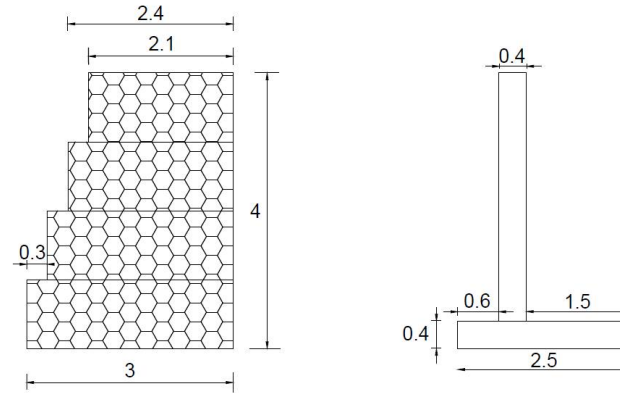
Overall dimensions (in meters) of gabion wall (left) and cantilever wall (right)
